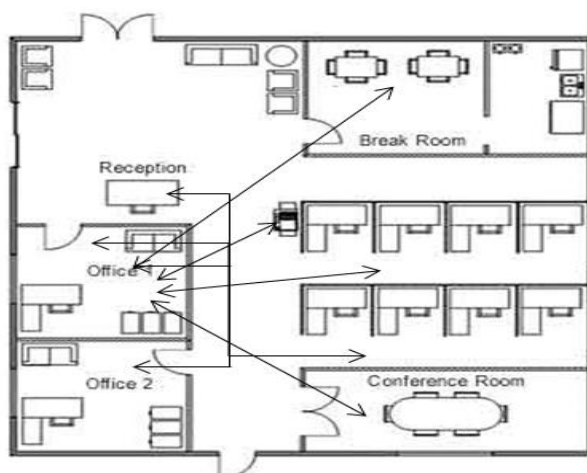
Pm's Office layout plan Courtesy of <http://www.mehve.net>
